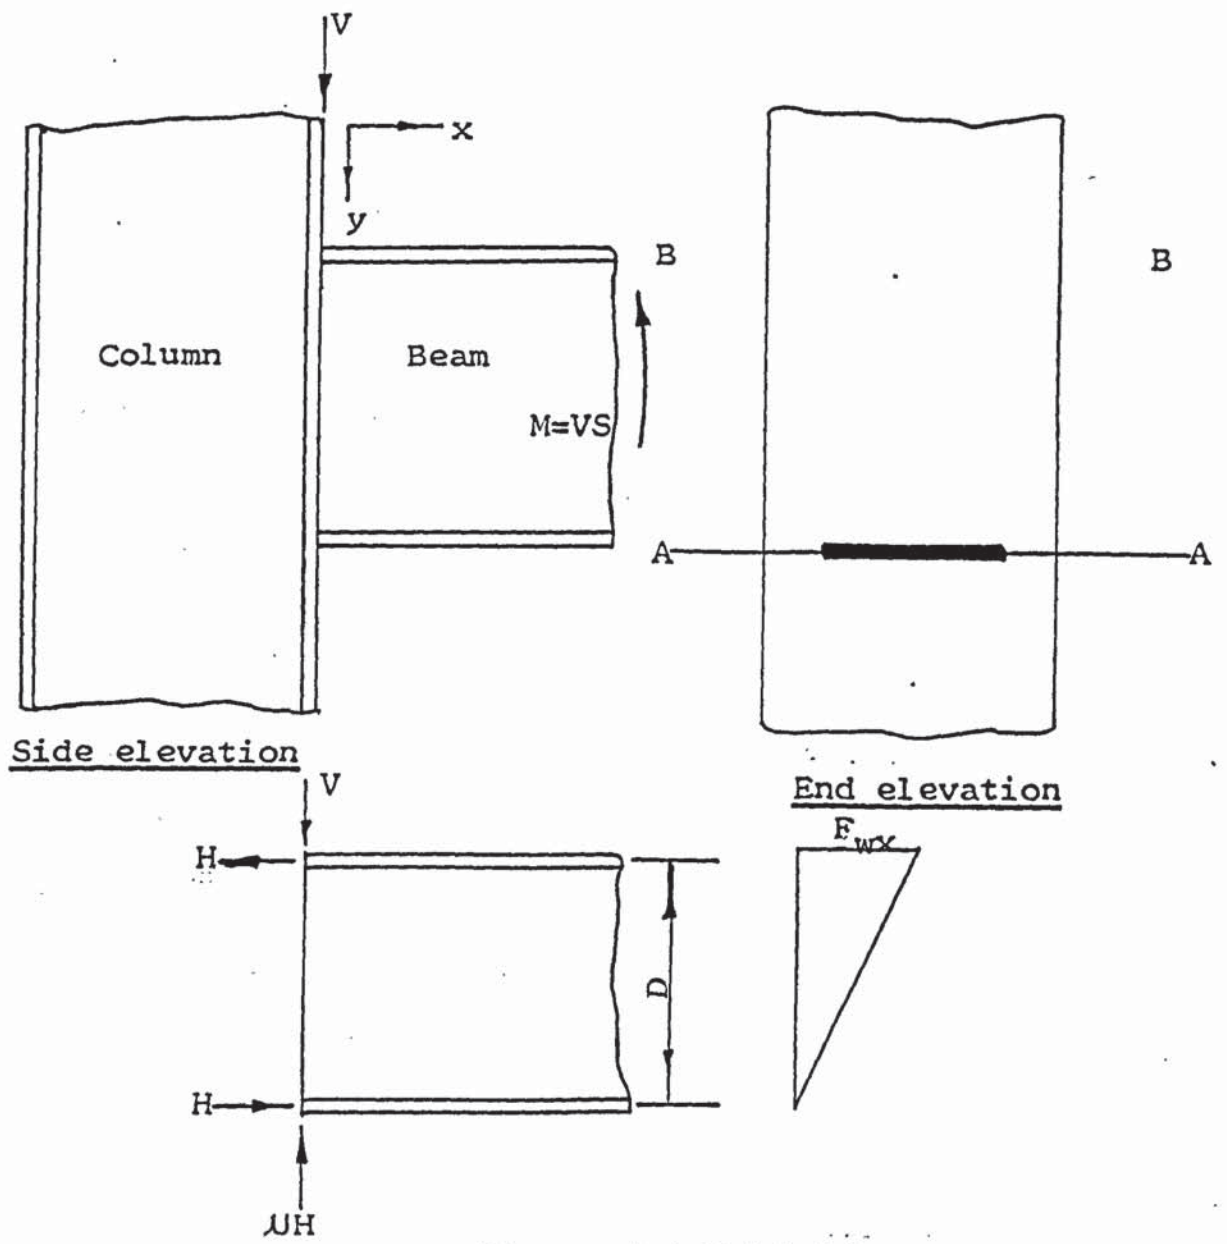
Welded beam-to column connection subject to shear and bending.
